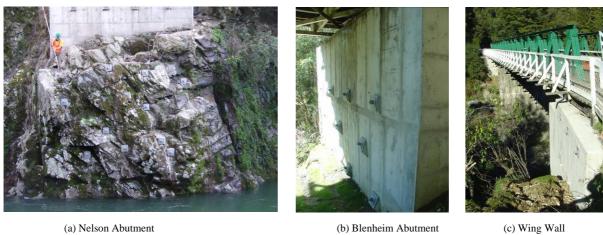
Rock anchor strengthening of abutments at Pelorus Bridge
